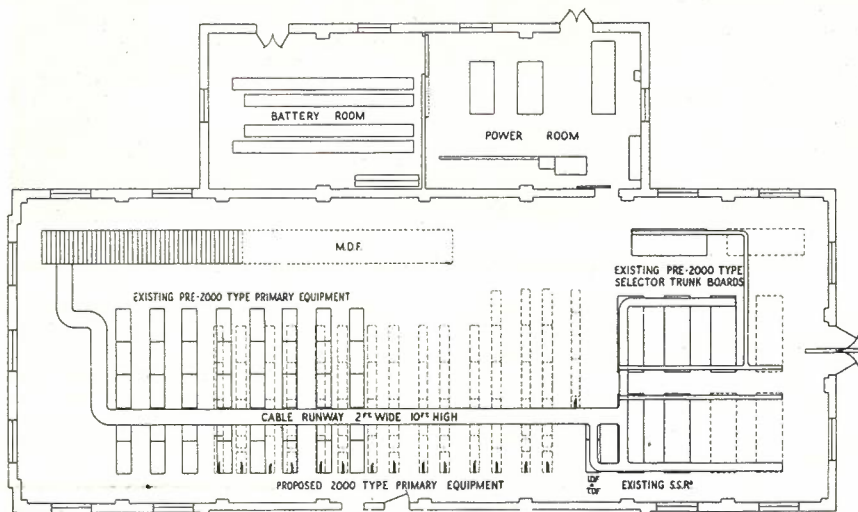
Disposition of existing primary and trunking equipment forty feet apart, bridged by one two feet wide, ten feet high runway. Ultimate 2000 type primary racks shown dotted.
